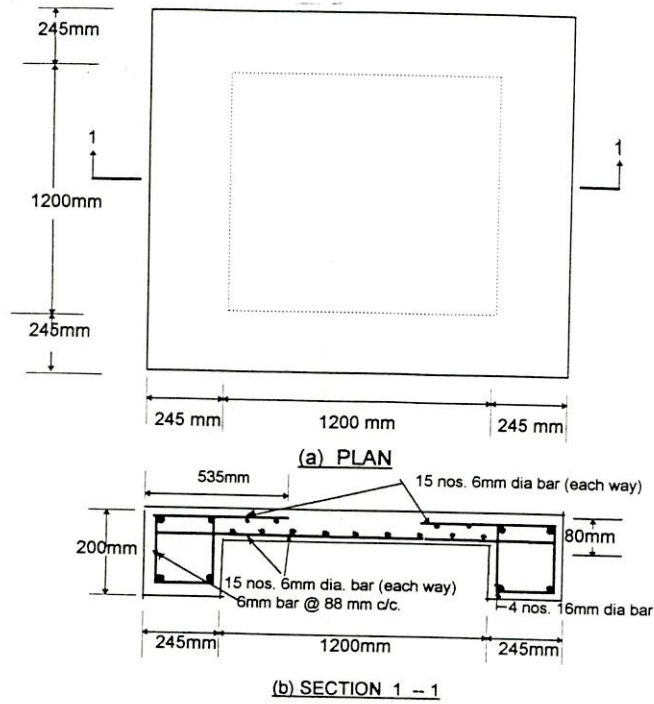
(a) Plan (b) Section and reinforcement details of SLAB1
